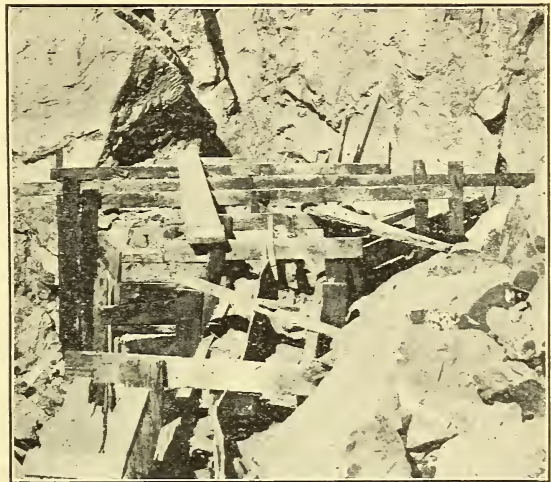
Corewall of Lower Otay Dam, Cal., under construction.
